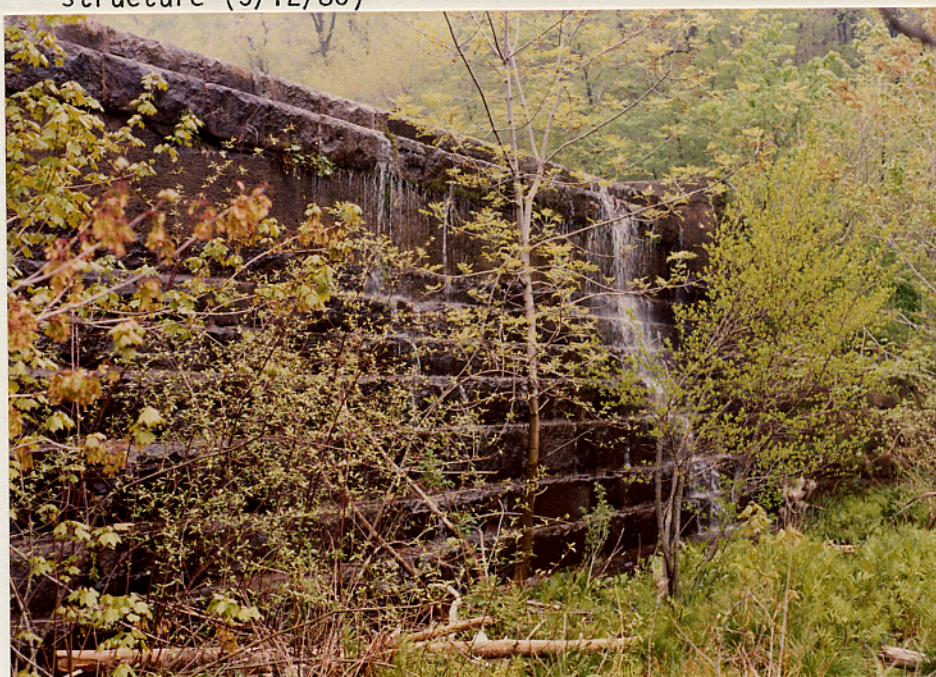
Stepped masonry spillway wall. Note vegetation in spillway channel and grass growing from masonry joints. (5/12/80)
